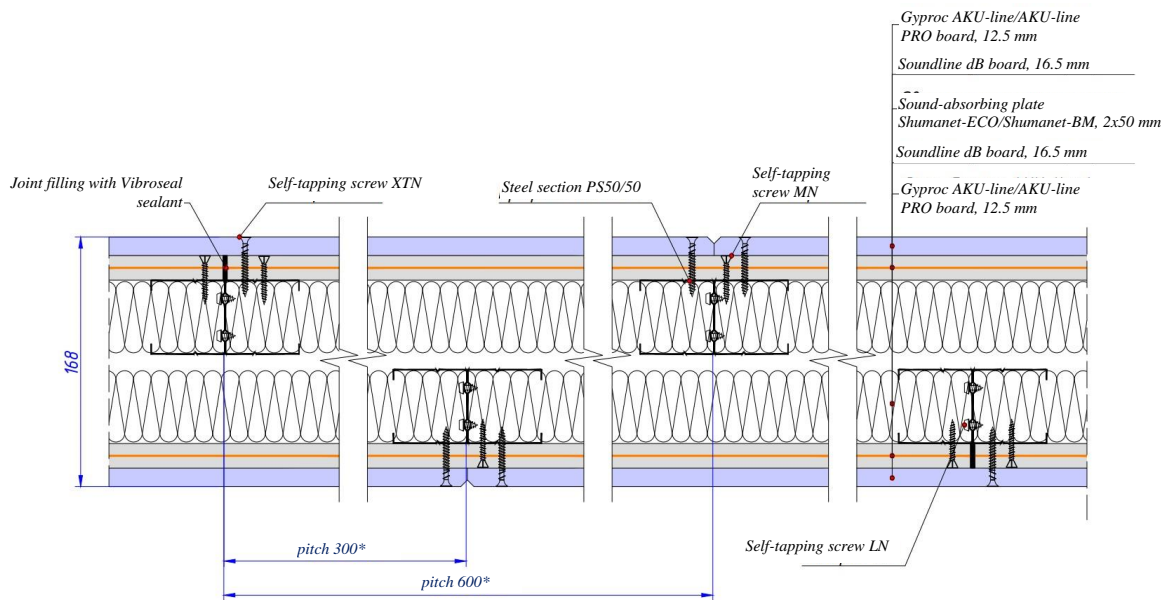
Location of studs in double independent frame soundproofing partition structure made of PS 50/50 steel section.
